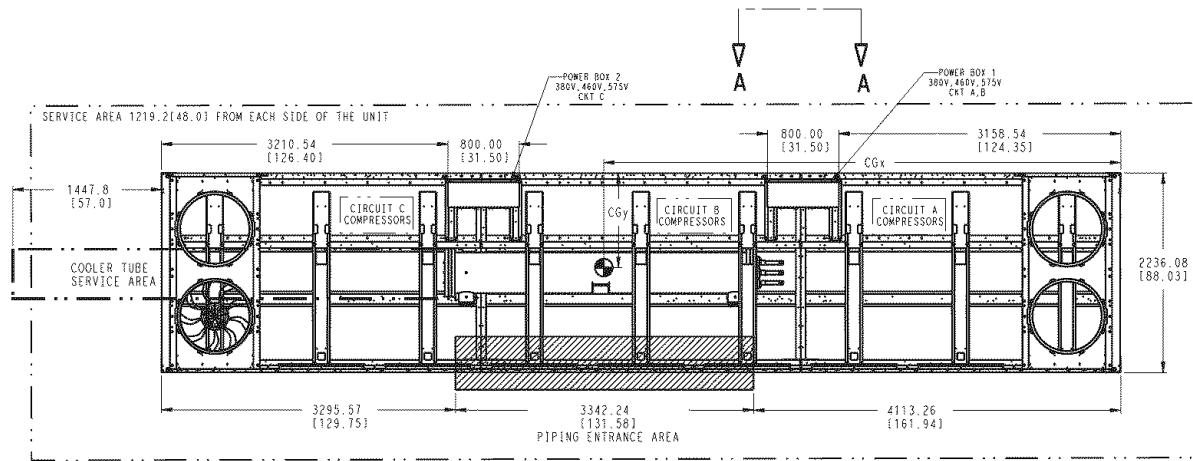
30RB250 Air-Cooled Chiller Dimensions
